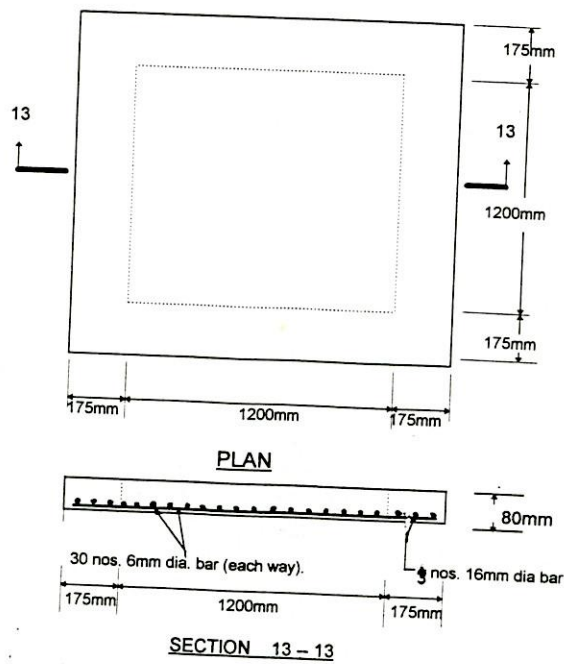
(a) Plan (b) Section and reinforcement details of SLAB13
